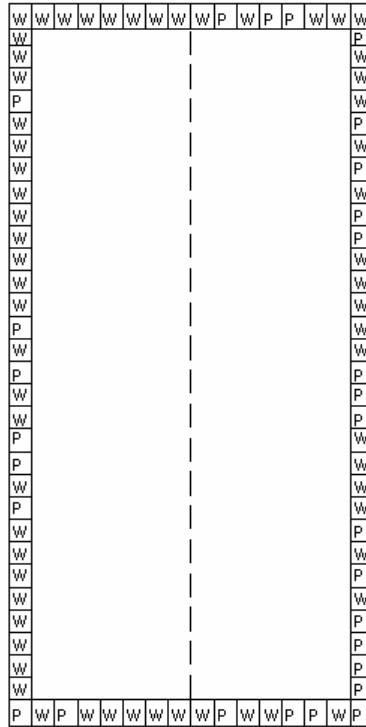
Sheathing nail failure modes for Wall A1.
